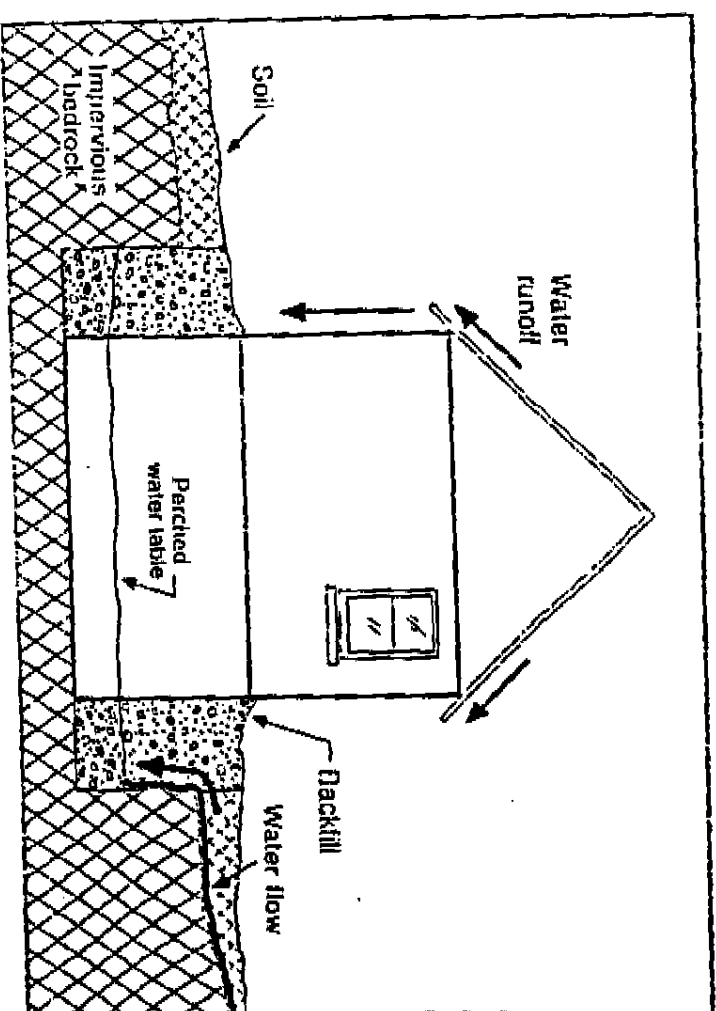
Perched water table in a house excavation dug into impervious bedrock (modified from Jochim, 1987). This is an unwanted situation because runoff water is filling the excavation and infiltrating the bedrock.
